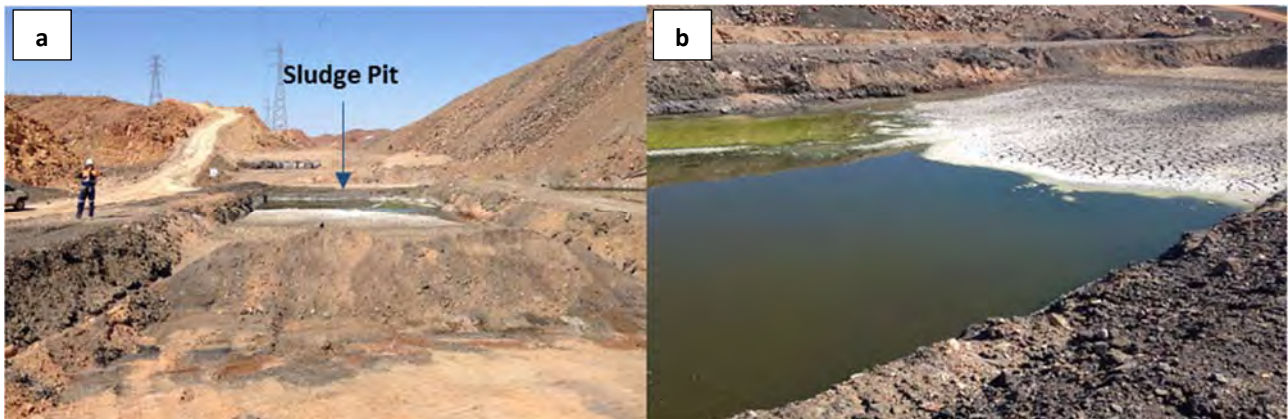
Sludge Pits. a) Sludge pit facing south, b) Sludge pit east wall facing west (August, 2015)
